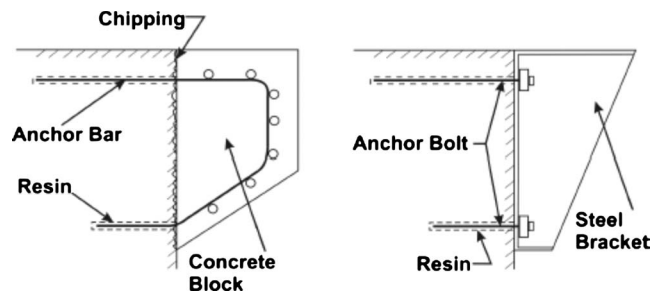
Details of concrete corbel (left) and steel bracket (right) seat extenders [adapted from Priestley et al. (1996)]
